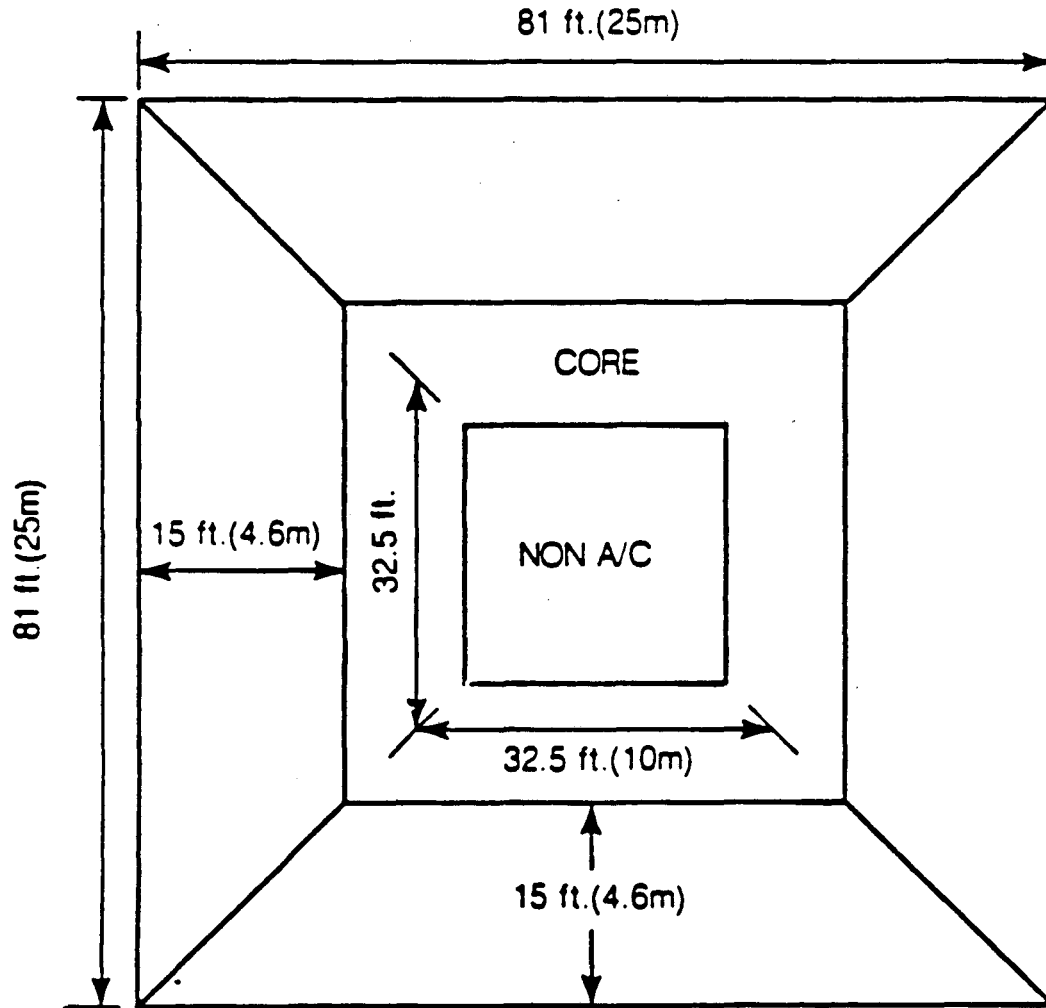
Plan of the Malaysian Base Case building with 10 floors and 5200 m<sup>2</sup> of total conditioned floor space.
